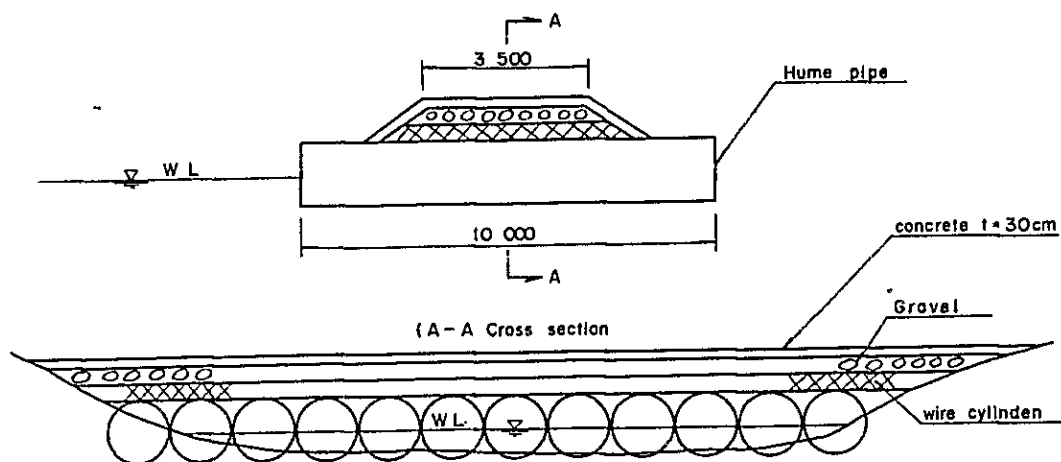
Crossing Rivers Structures for Concrete Pipes (Hume Pipes)
